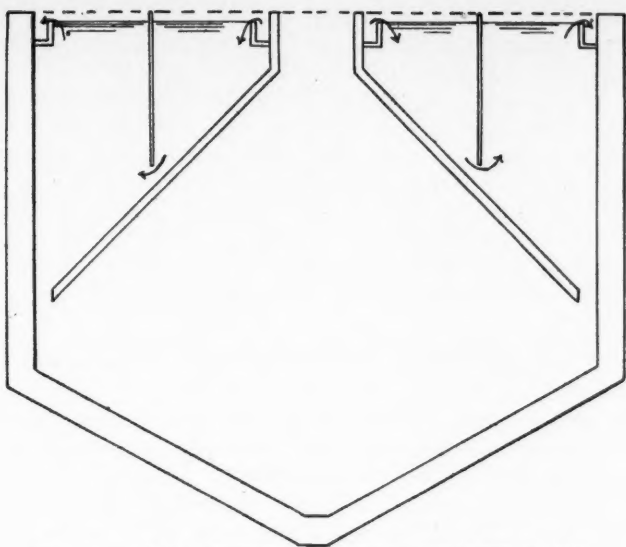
PLAN SUBMITTED FOR IMHOFF TANK.
